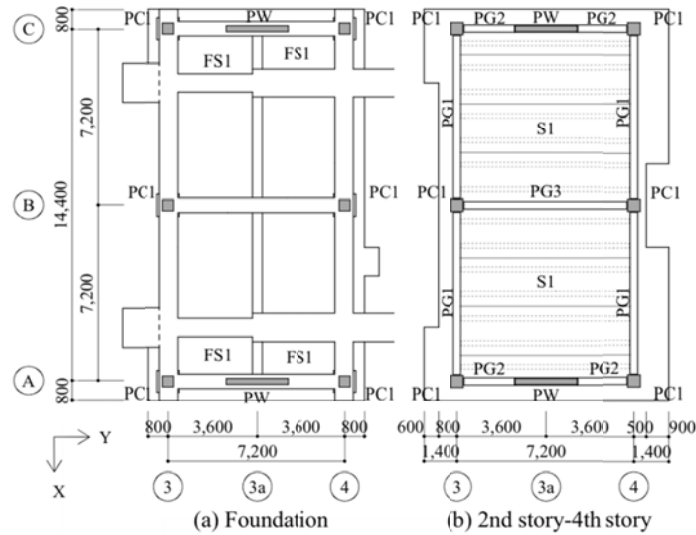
Floor plan of the specimen (Unit: mm)
